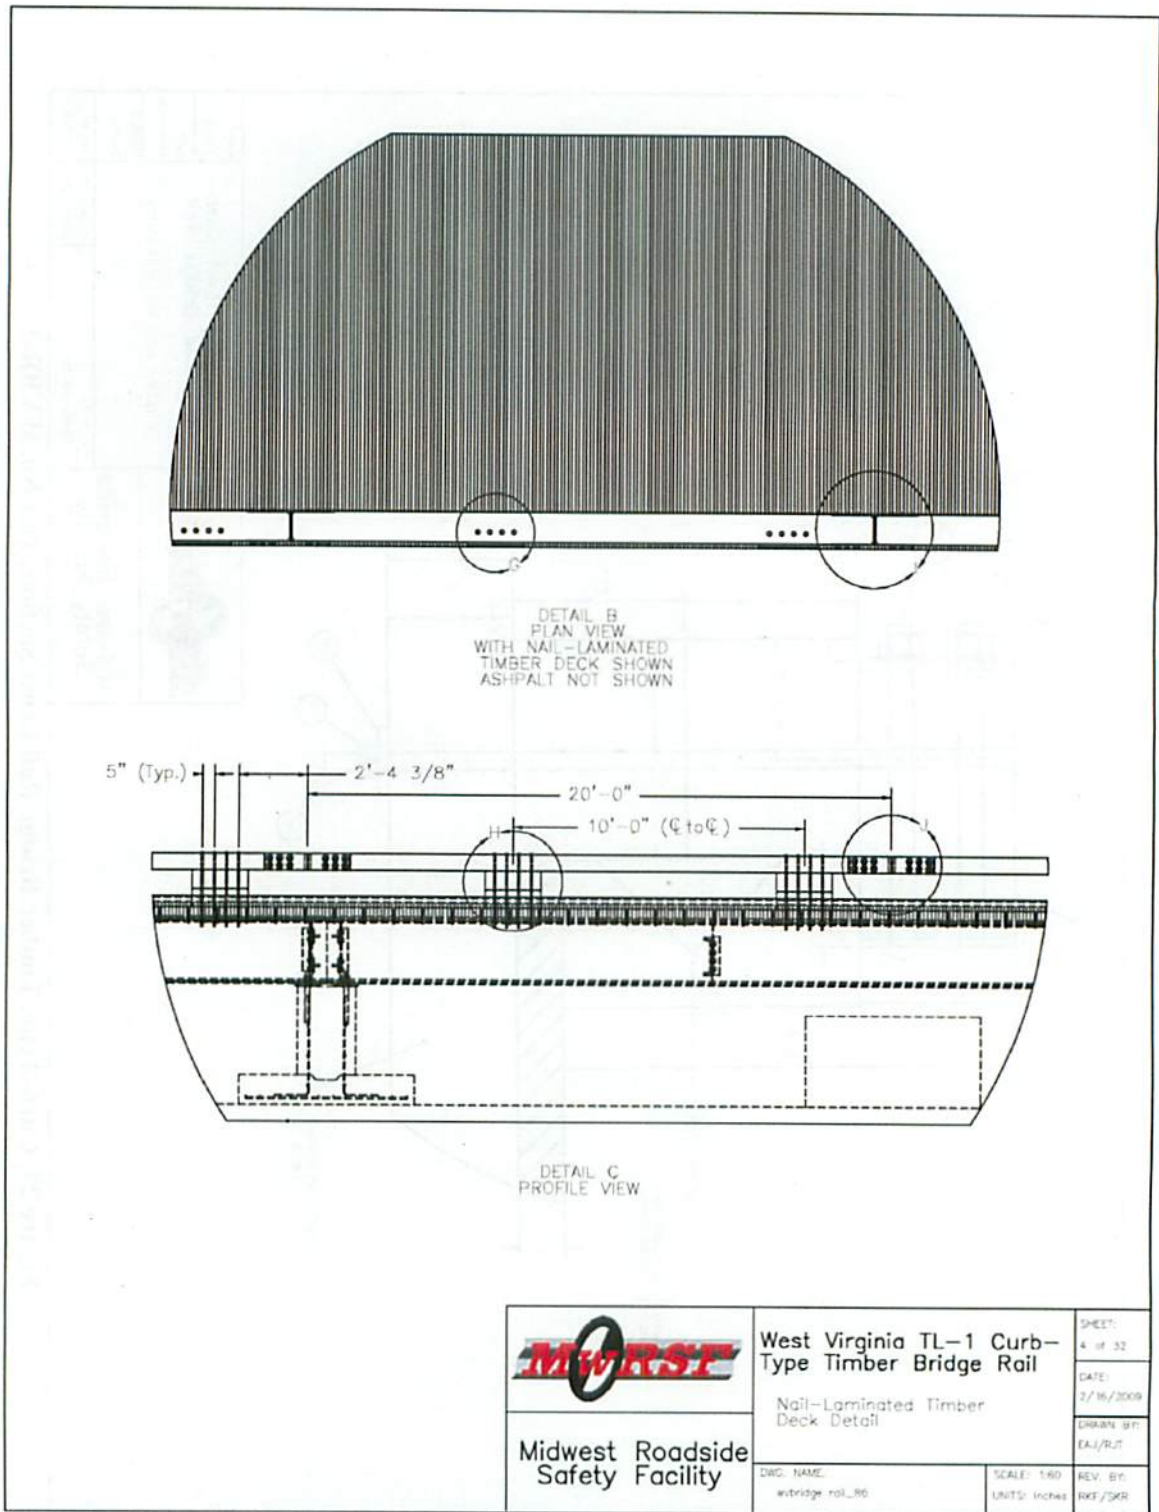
Timber Bridge Rail, Top and Front Views, Test No. WVBR-1
